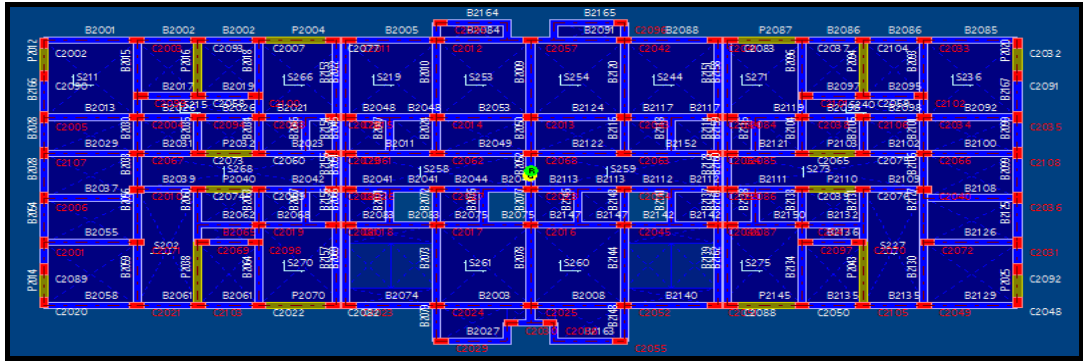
Plan of Twenty Eight Stories and Shear Wall System
